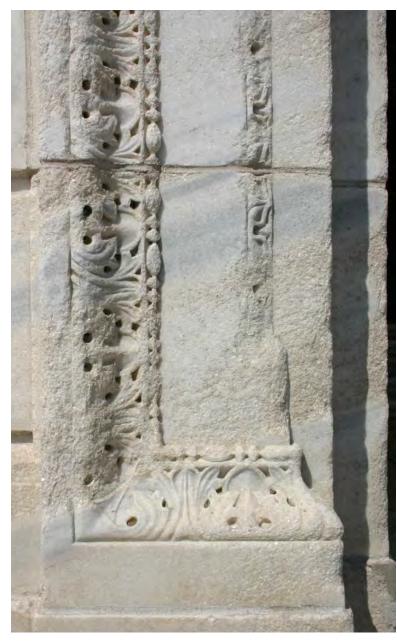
(above): Typical portal jamb (south entry). Erosion of detail is extensive at the south entry. Replacement required to restore deteriorated material at this level would be extensive.
